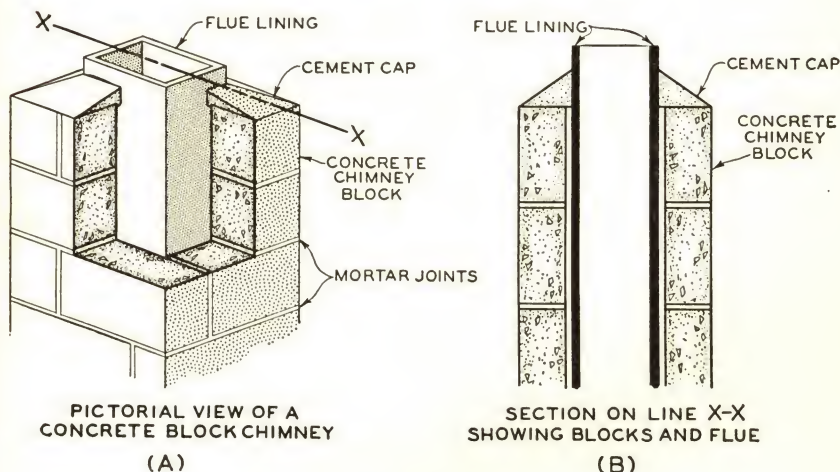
Pictorial and Section View of a Concrete Block Chimney
